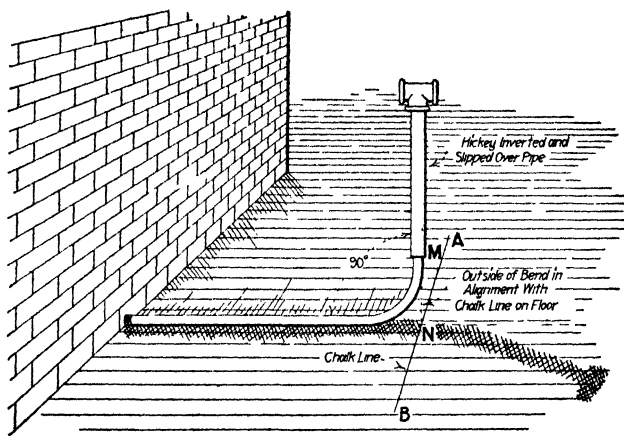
Finishing the bend using inverted hickey as a lever.
